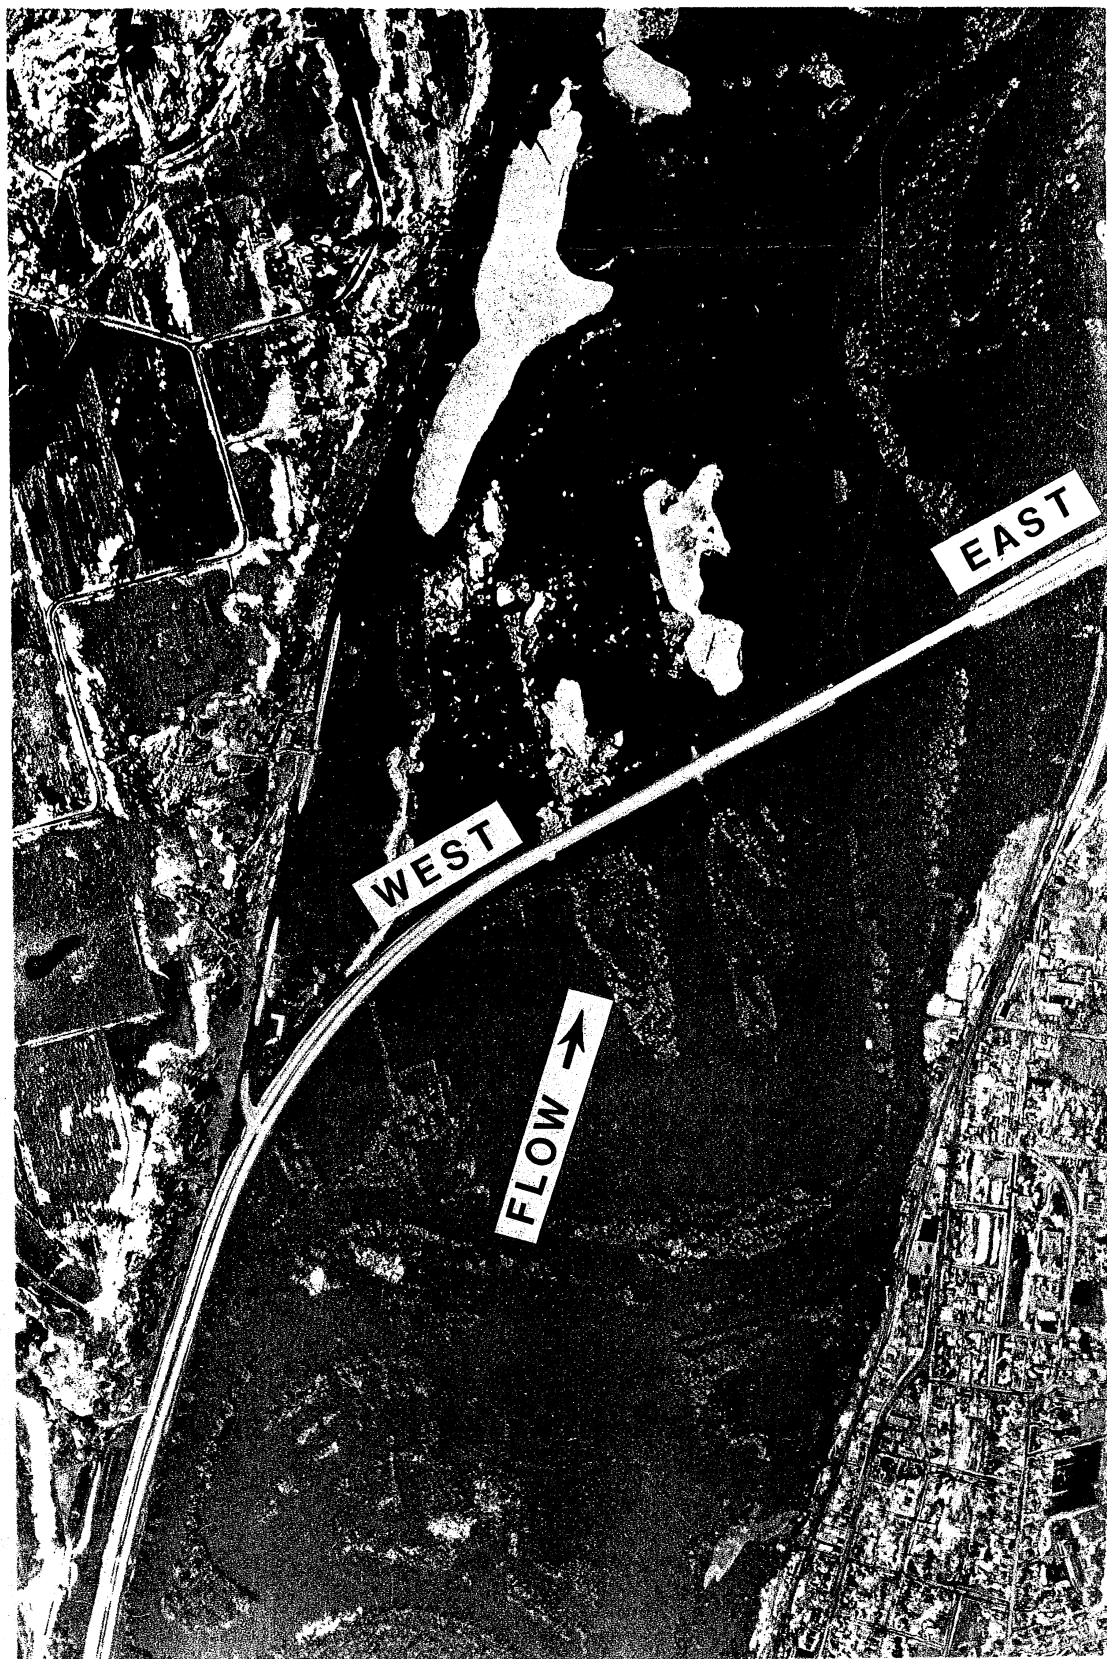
Bridge site during flood of 1965 (April 9, 1965).
